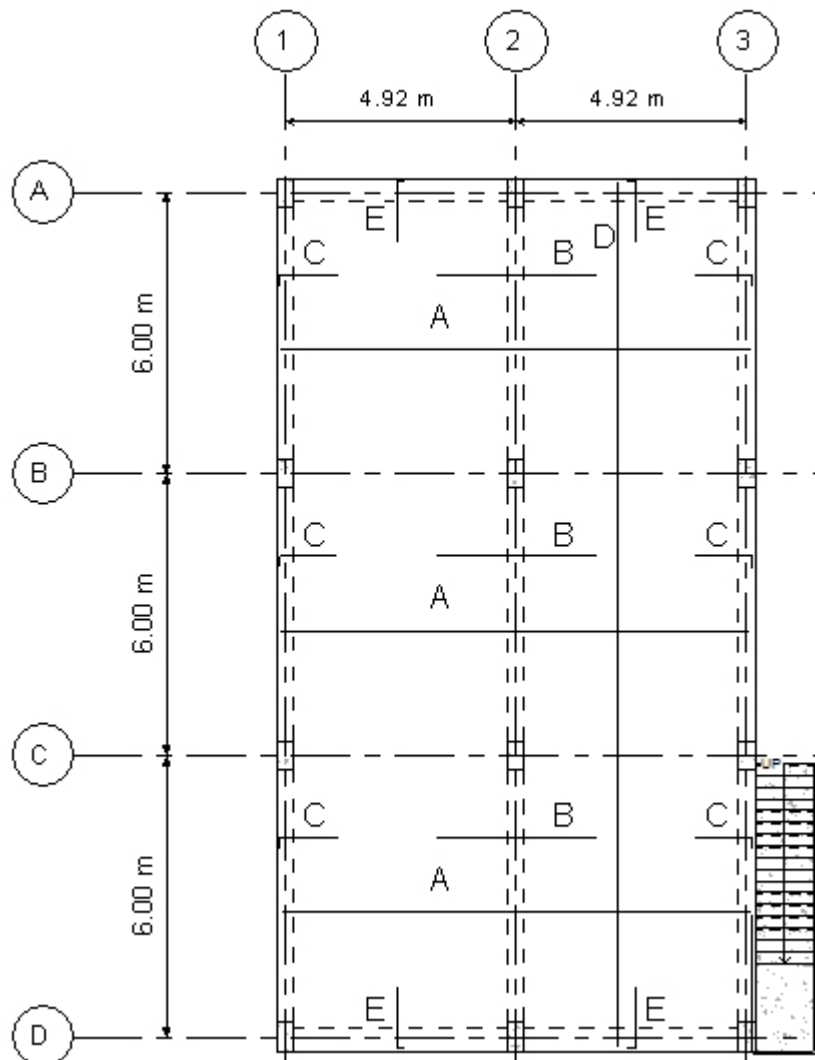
Slab reinforcement for Example 12.2-1. Continued.
